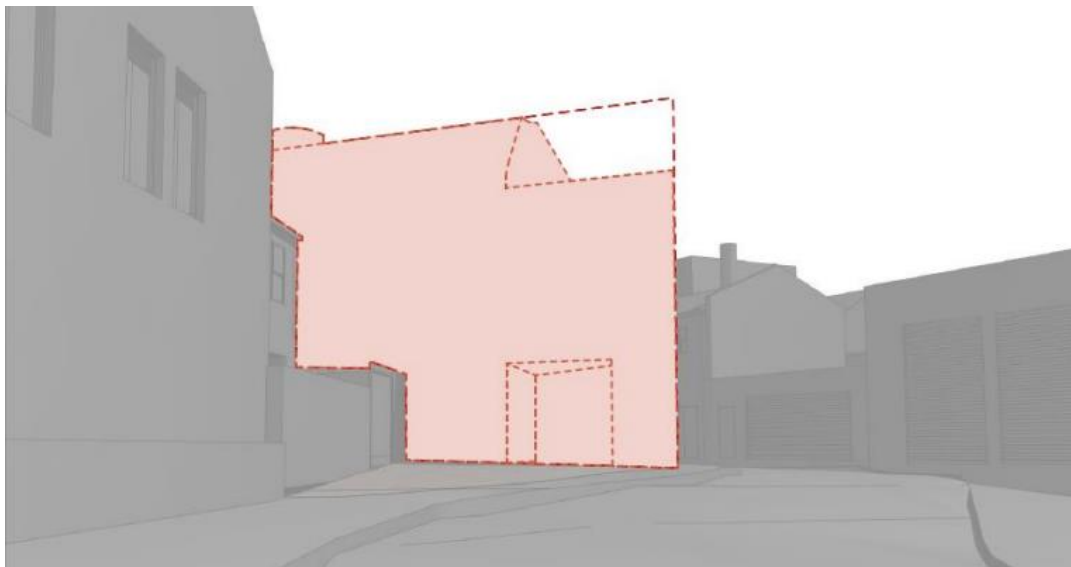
Reference scheme perspective as viewed from Craigend Street looking south
